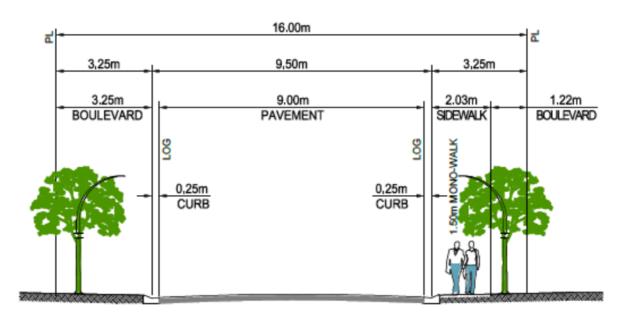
ROADWAY CROSS-SECTIONS (PROPOSED - INDUSTRIAL STREETS)
